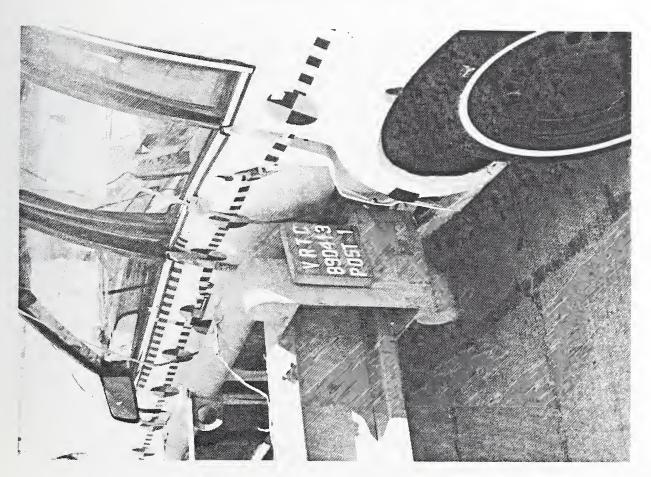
POST-TEST CLOSEUP LEFT REAR VIEW
